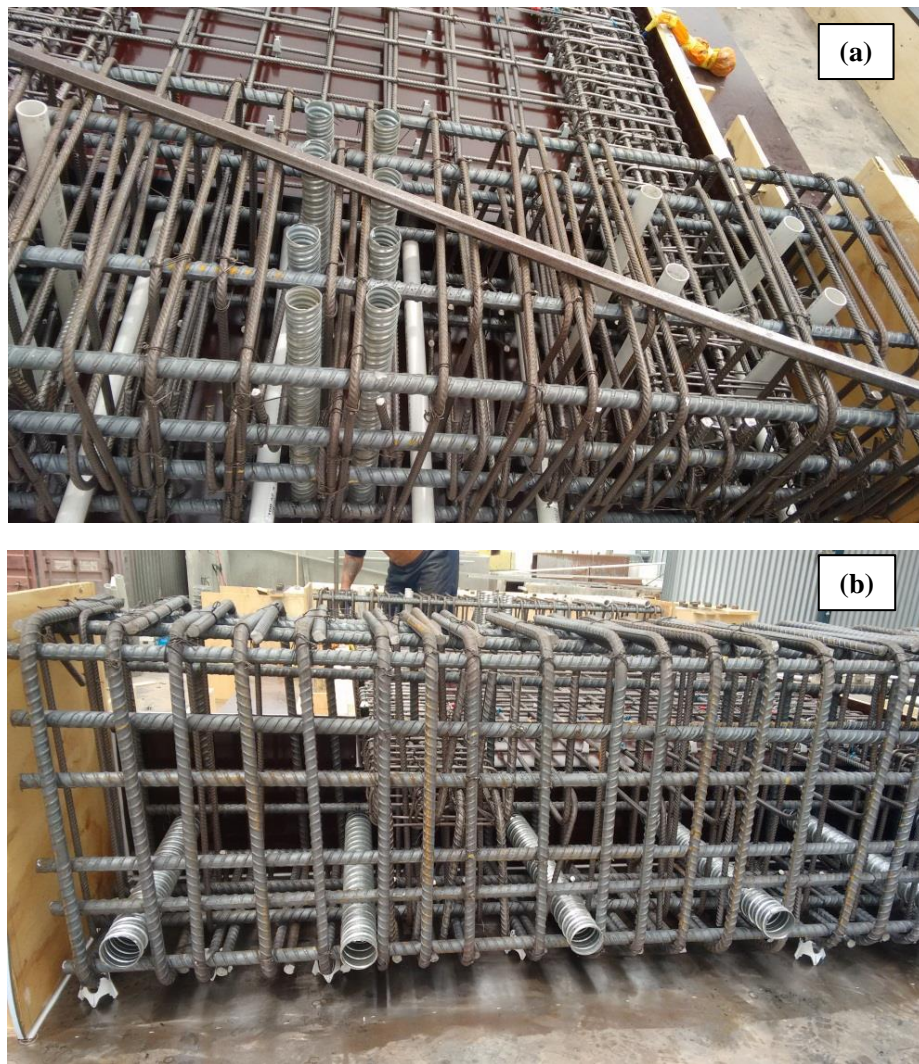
Drossbachs embedded in (a) cap beam and (b) foundation
